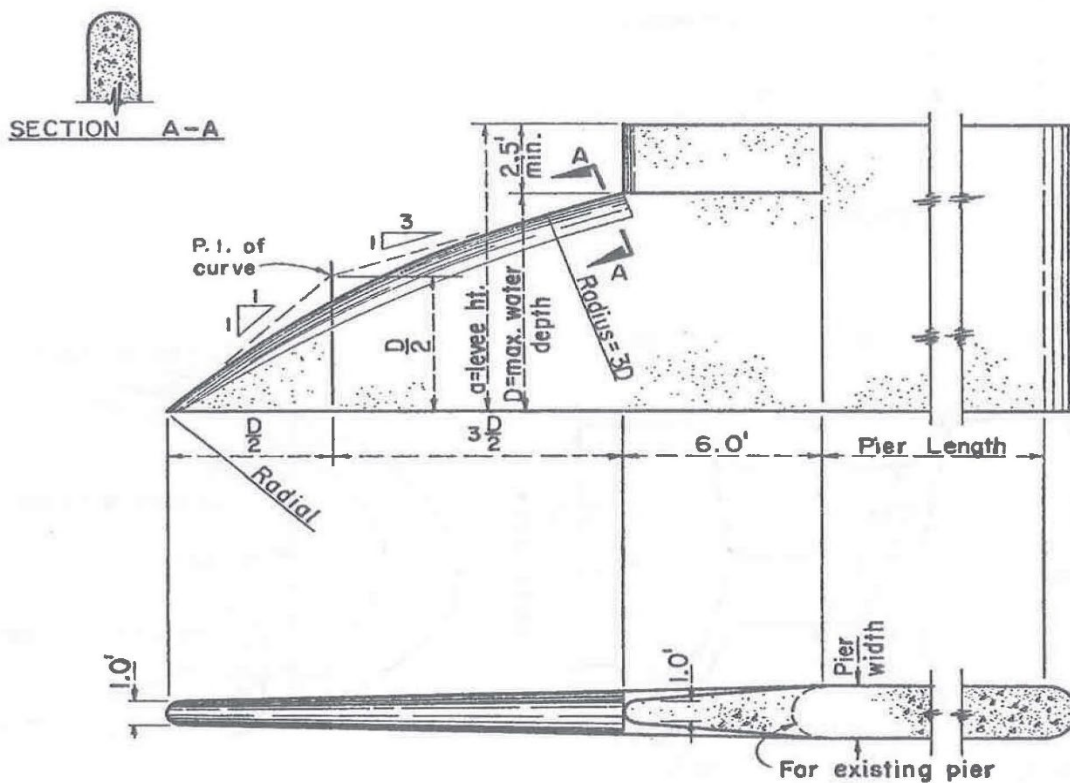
Typical Pier Extension for Bridge (LACFCD, 1982)
